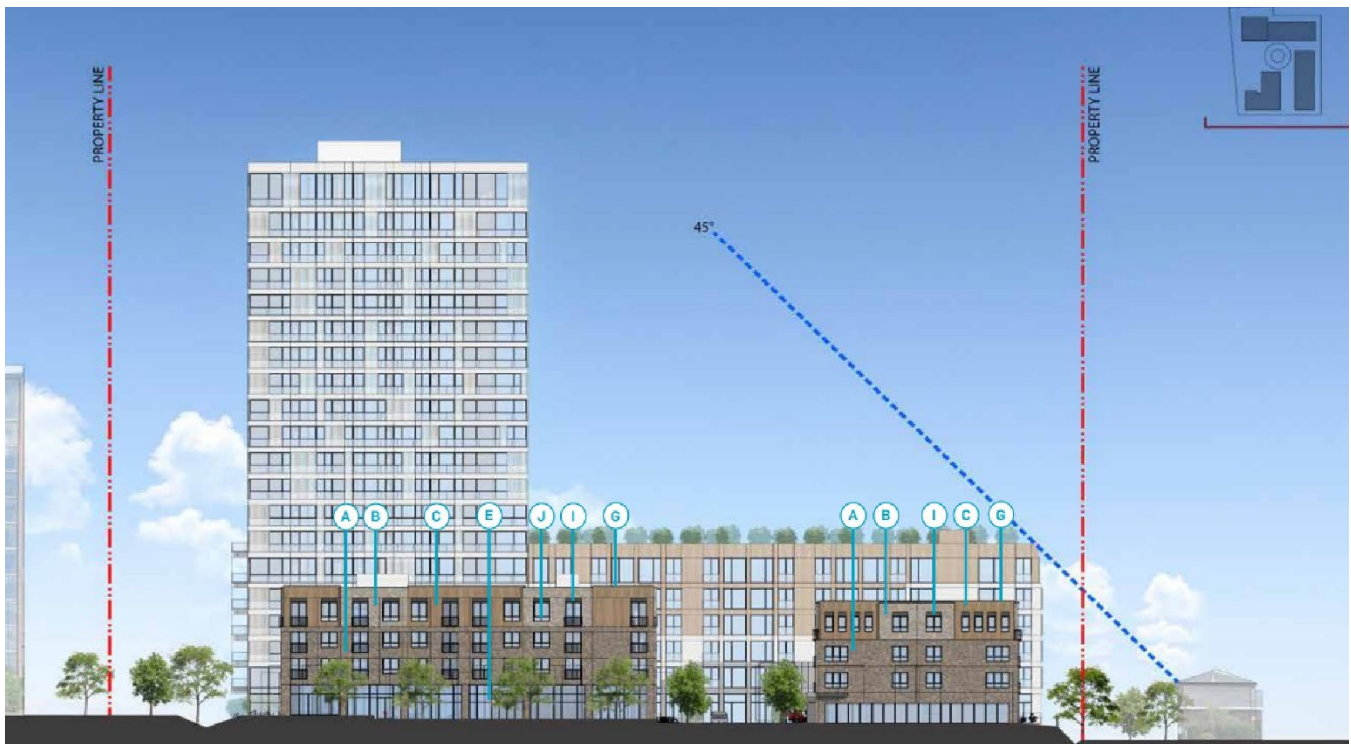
Tower perspective from revised development proposal, looking south from Ridgewood Avenue
